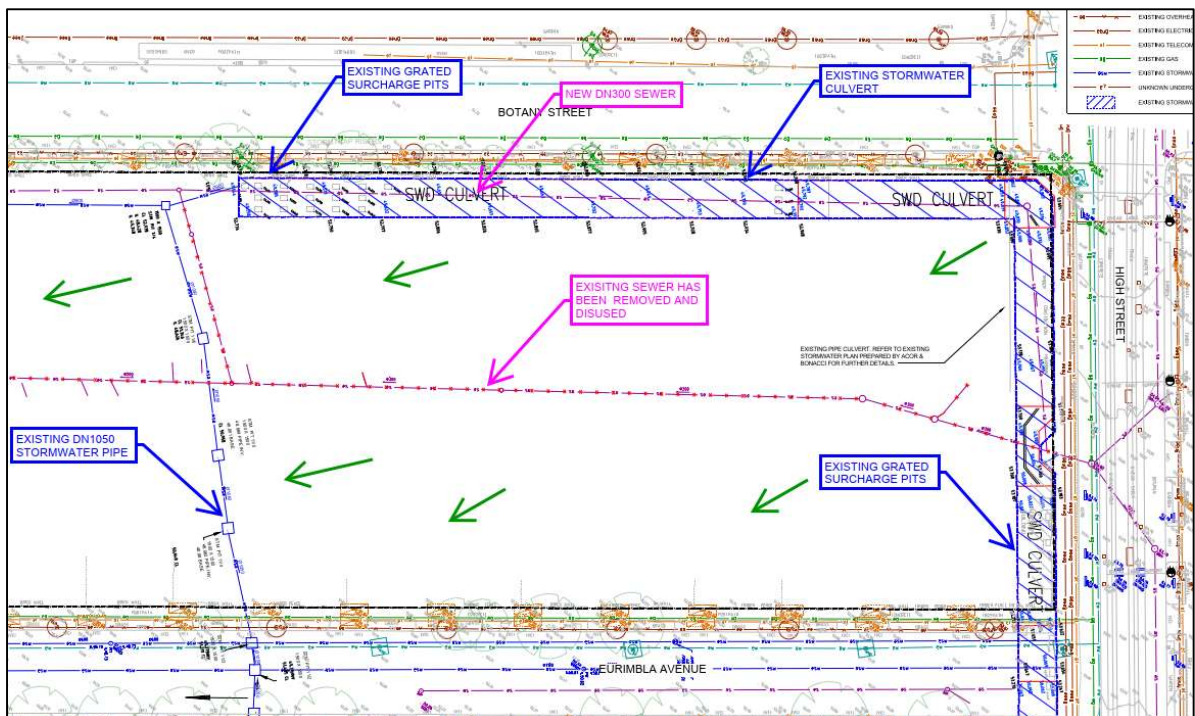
Existing Site Grading and Stormwater Infrastructure
